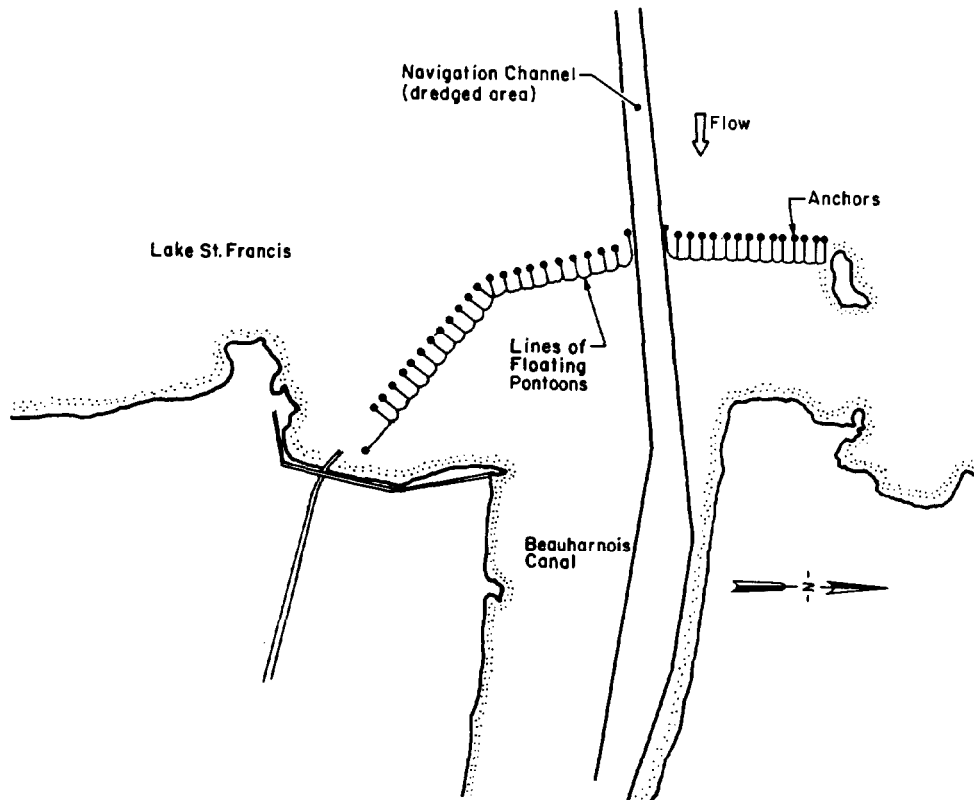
Plan view of the Lake St. Francis ice boom built in 1981.
